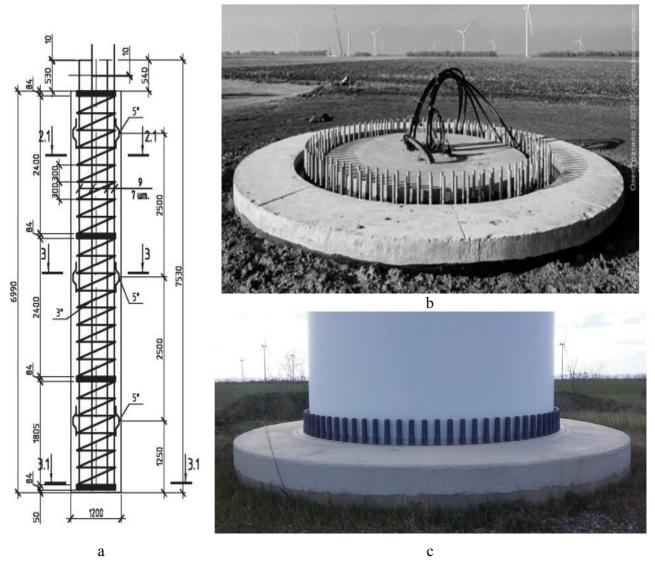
Rebar cage of piles and anchor of the foundation: a – the cage section; b – general view anchor of the foundation; c – construction
